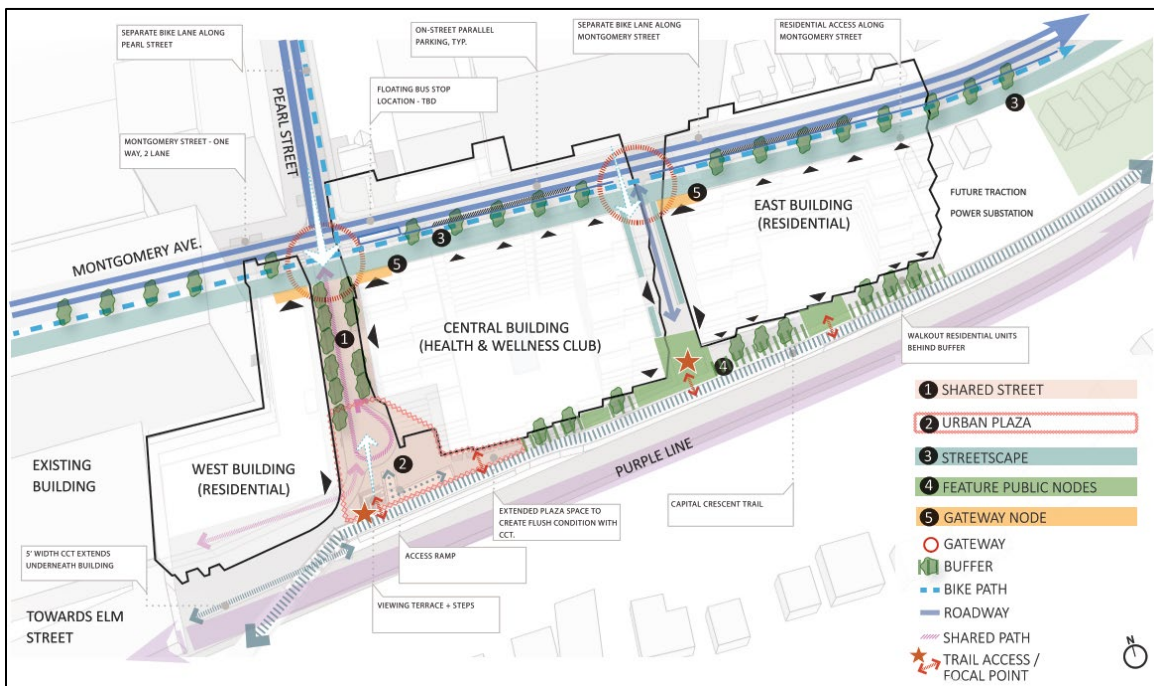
Framework development plan for Sketch Plan No. 320260020
